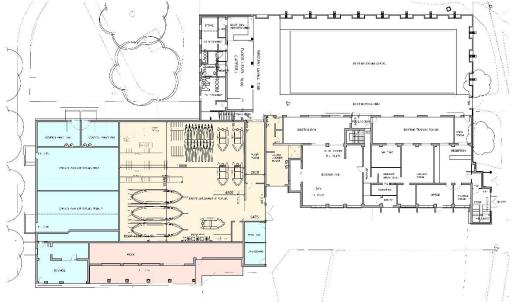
Ground Floor Plan (extract from plans by Bergstrom Architects 2017)
